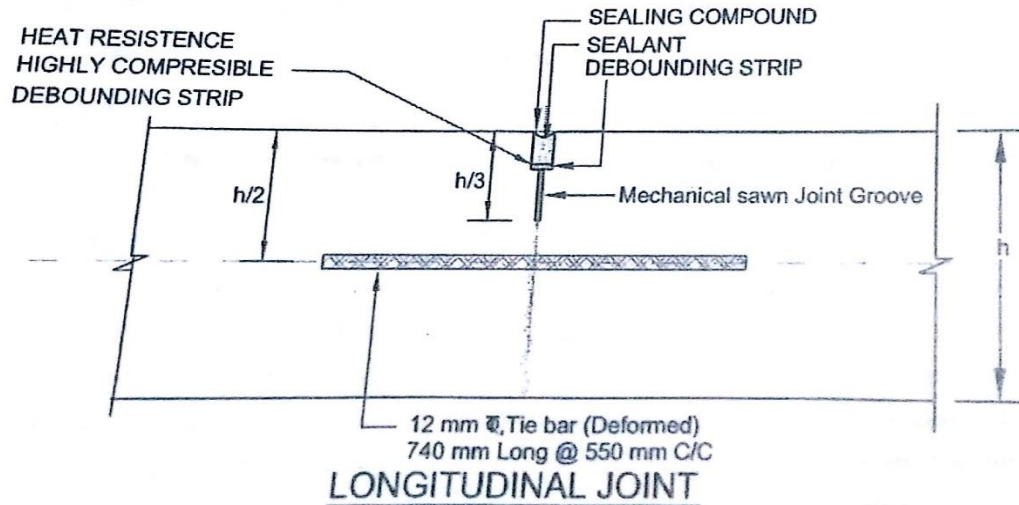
Section of longitudinal joint in Pavement Quality Concrete (PQC)
